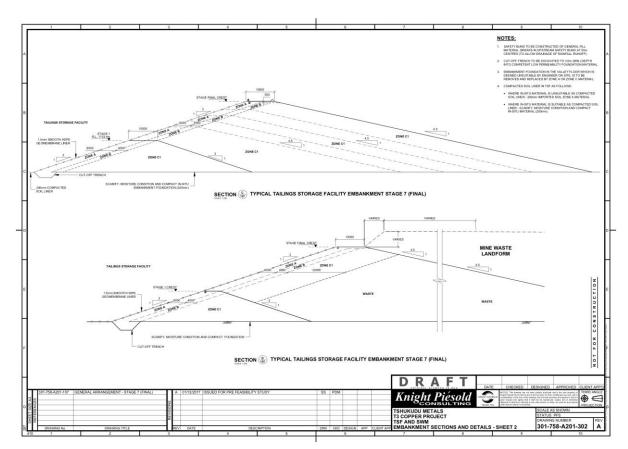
Plan and section view of tailings disposal facility (Knight Piesold, 2018)
